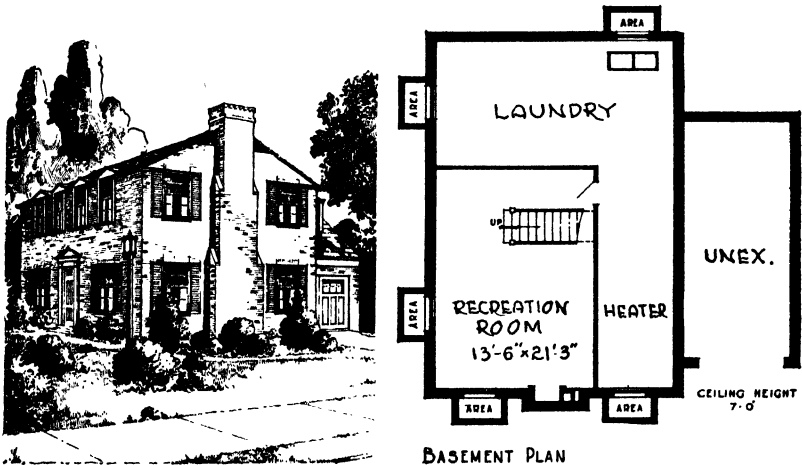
Exterior View and Basement Plan of 7-Room Brick Veneer Residence
